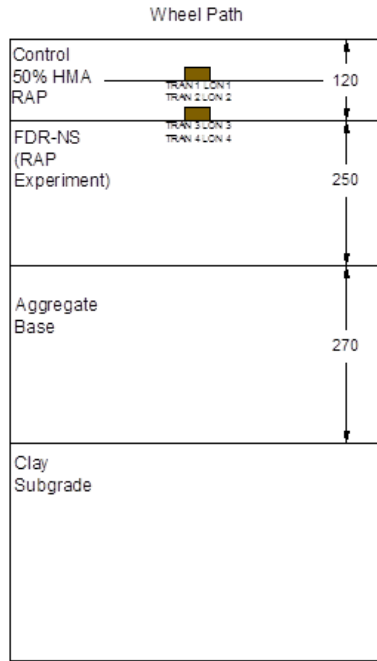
Illustration. Cross section of pavement structures and instrumentation for the 50%-RAP test section at UC-Davis (Multi-depth deflectometer not shown for clarity).
